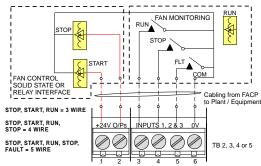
Fan Termination Board Layout and Typical I/O Wiring
